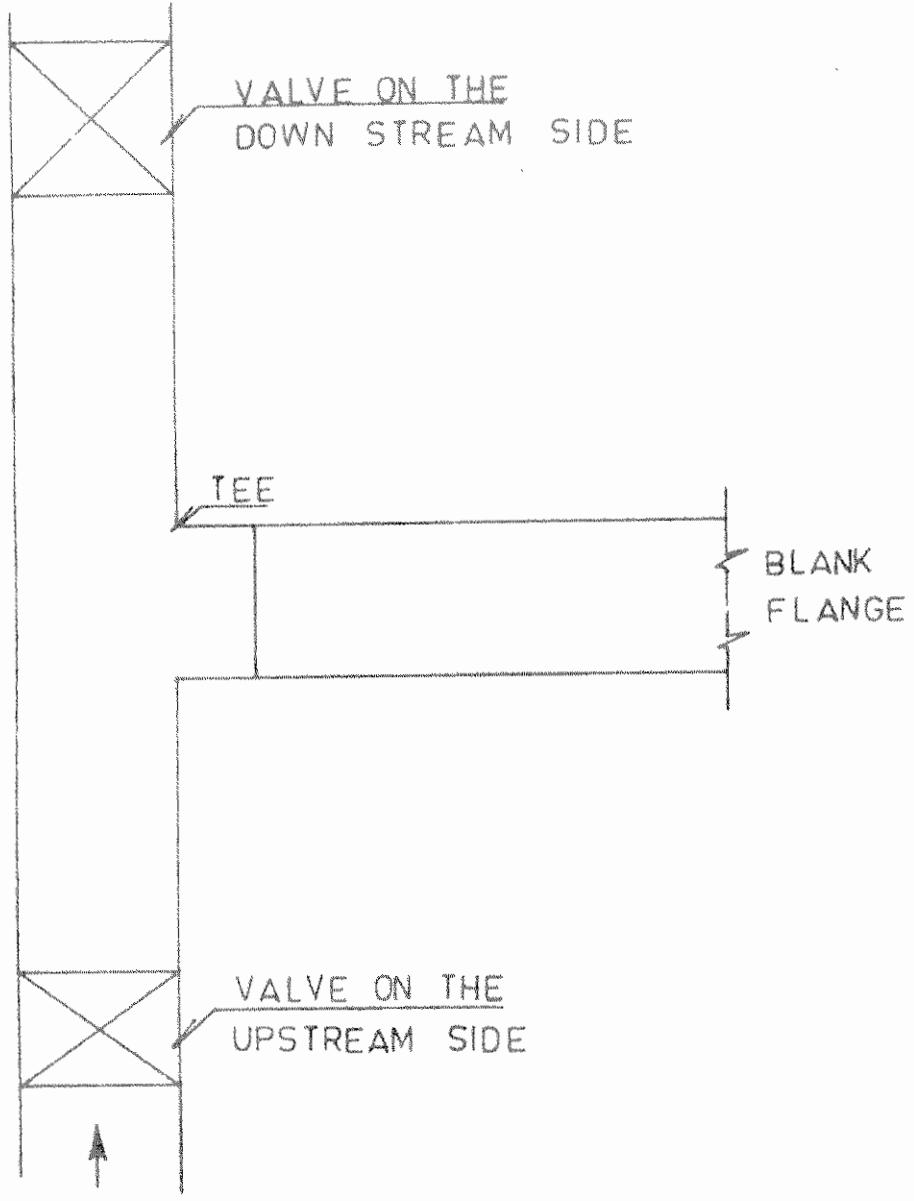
THE BRANCHES TO ENABLE SWABBING
